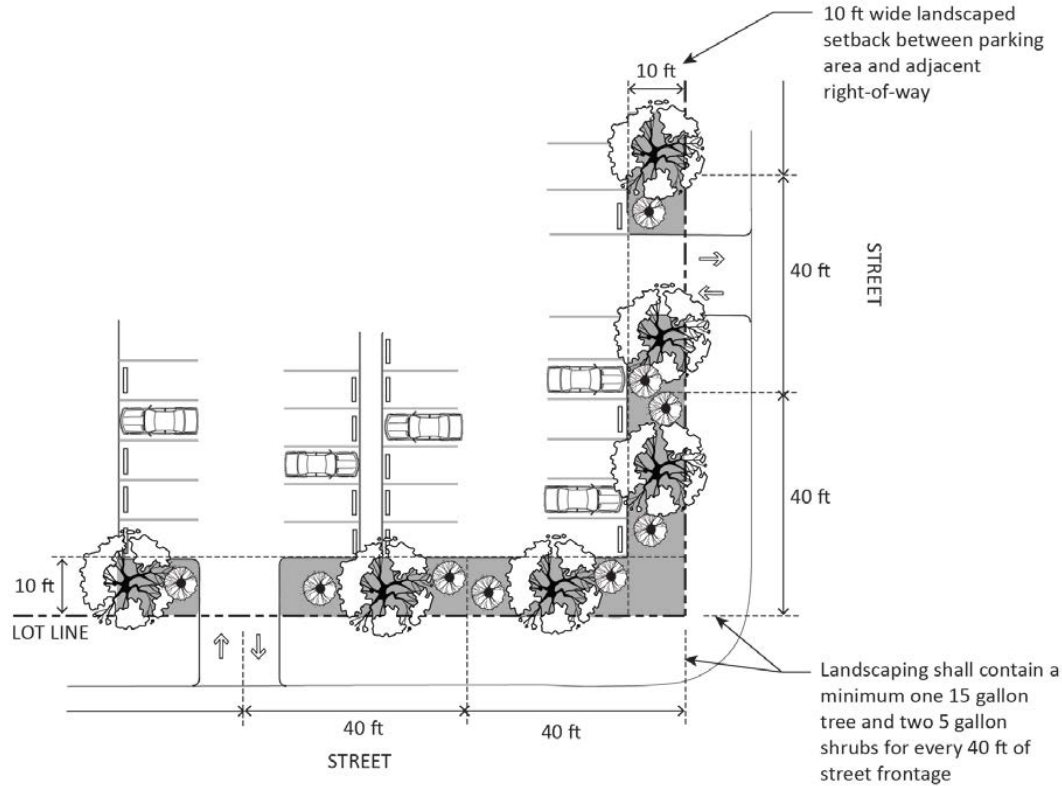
D.2.A: LANDSCAPED SETBACK BETWEEN PARKING AREA AND RIGHT-OF-WAY
